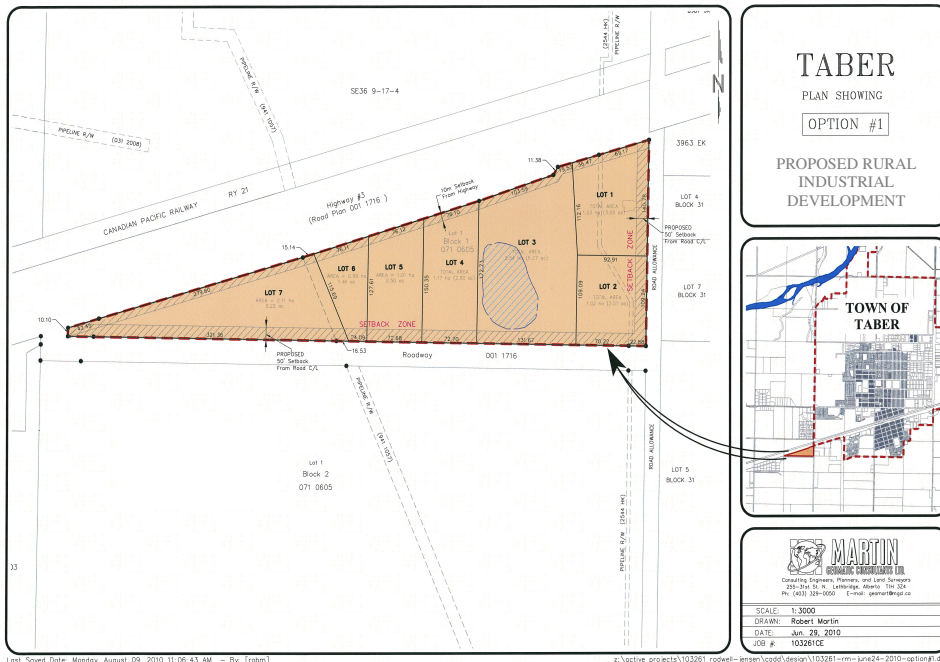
Proposed Taber Rural Industrial Site Plan
